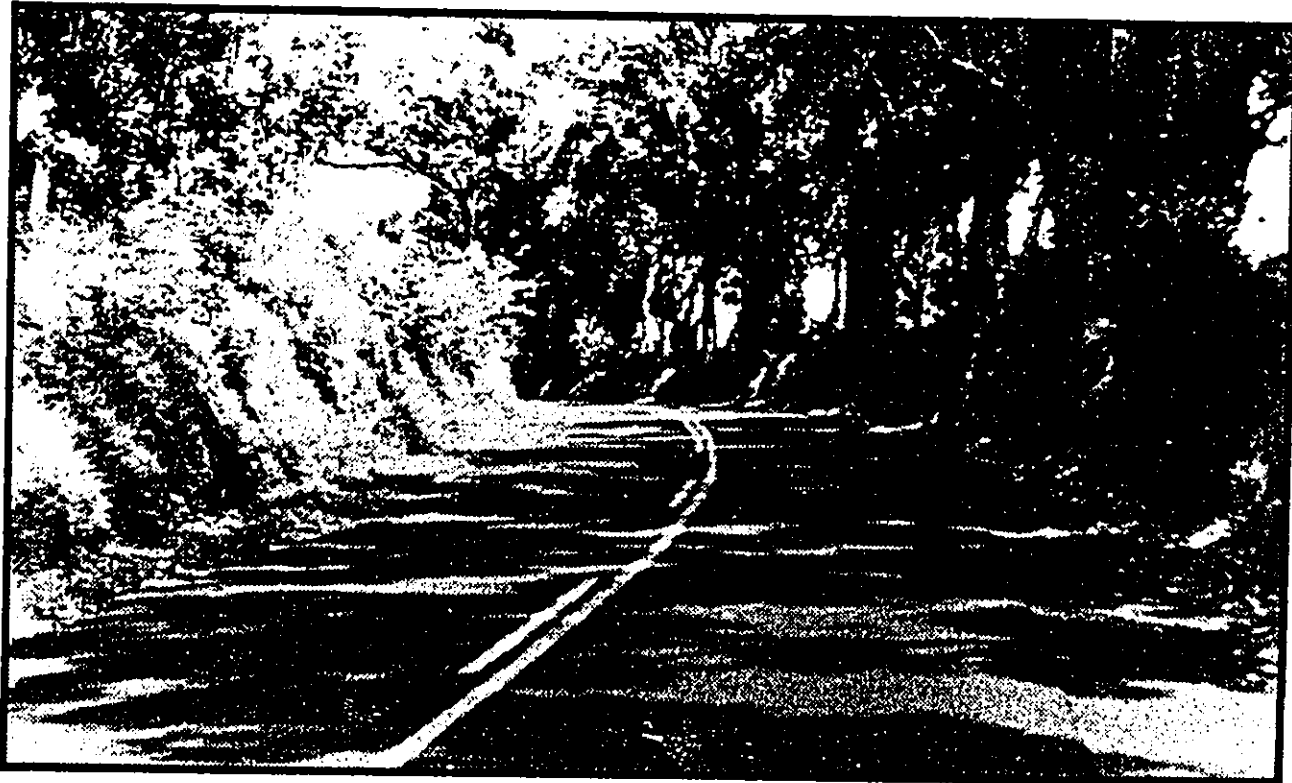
Typical view of the Kuhio Highway between Kalihiwai and Princeville. Note narrow shoulders and blind curve. Alternative W would make this spot similar to Plate 2.
